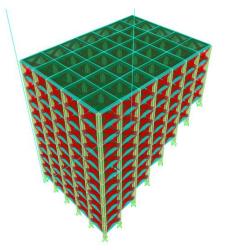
3D view of Brick infill equivalent strut stepback building.
